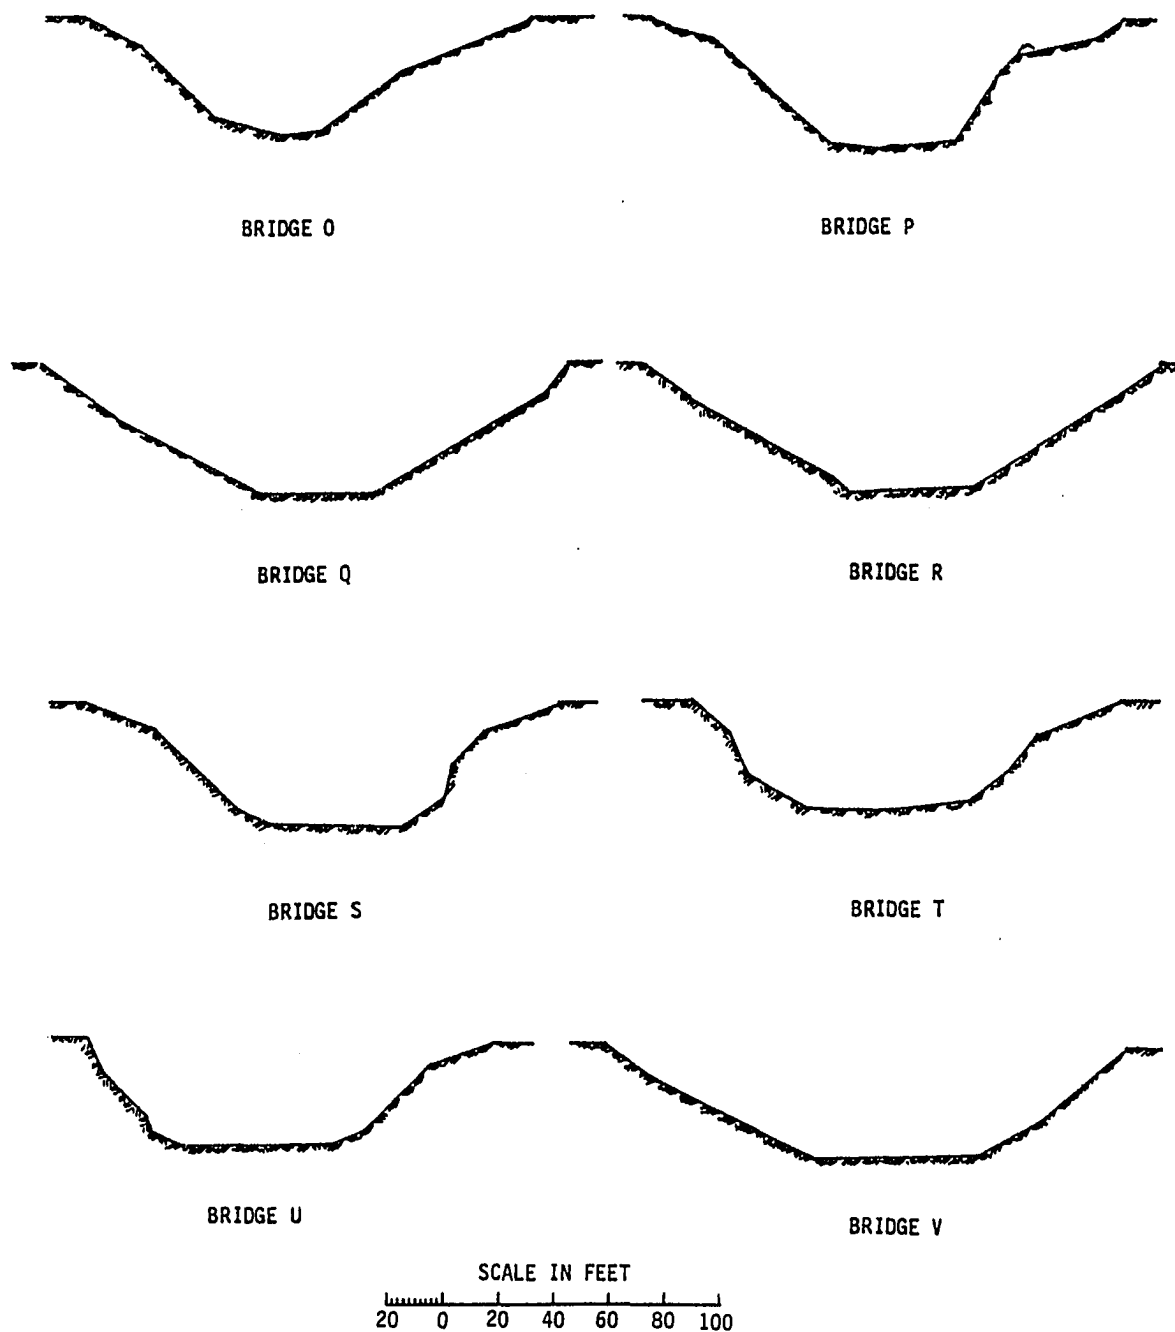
Cross section of the Willow Creek at bridge crossings in 1966 for bridges O, P, Q, R, S, T, U, and V
